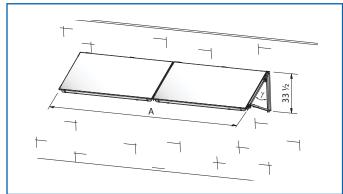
Installation dimensions of wall mounting kits for Logasol SKN3.0-w and SKS4.0-w landscape flat-plate collectors; dimensions in inches (dimension A Fig. 83)
